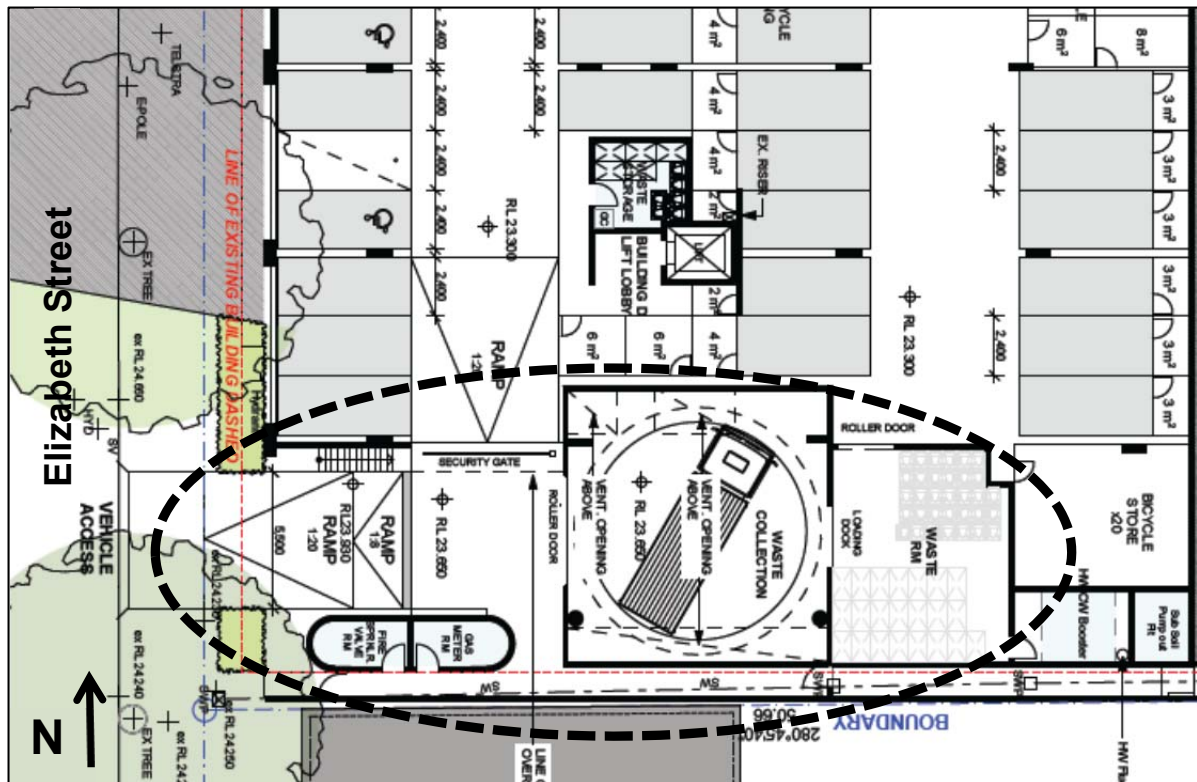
Proposed on-site garbage collection area, including vehicle turntable, in the basement car park.
